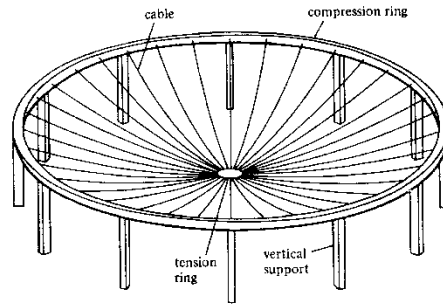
(left) Cable supported roof composed of three element: cables, a center tension ring, and an outer compression ring.
